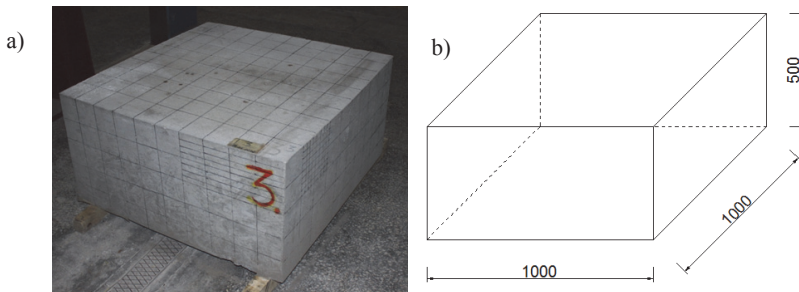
The view of concrete specimen: a) with measurement grid, b) scheme with dimensions
